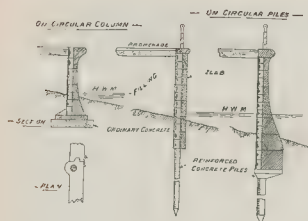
Typical Sections as applied to Seawall Slabs supported by Reinforced Concrete Piles.
